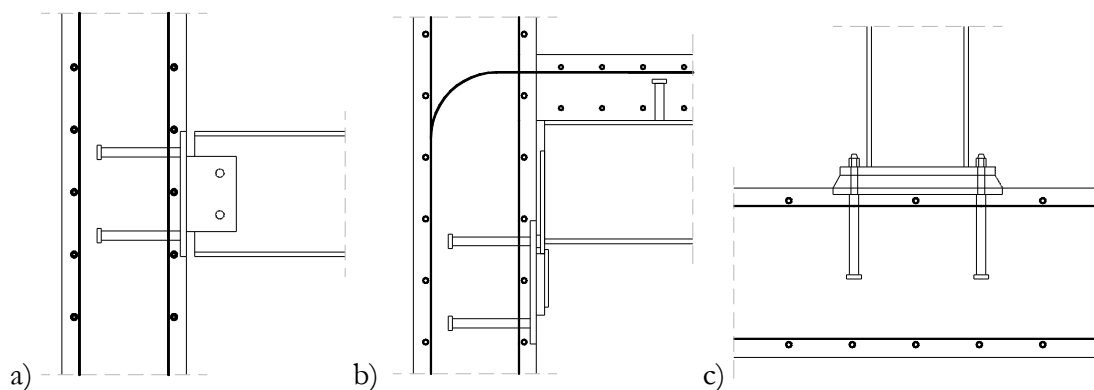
Joint configurations studied within the *InFaSo* research project: a) Steel beam to reinforced concrete wall; b) Composite beam to reinforced concrete wall; c) Column base
